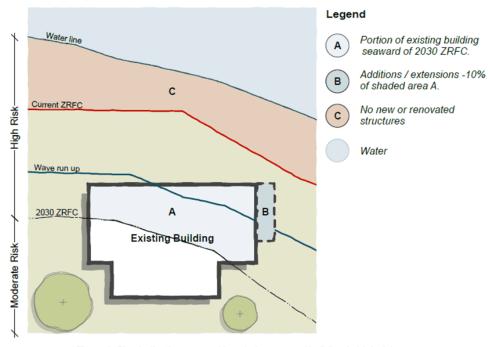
Plan indicating acceptable solutions area of building in high risk area
